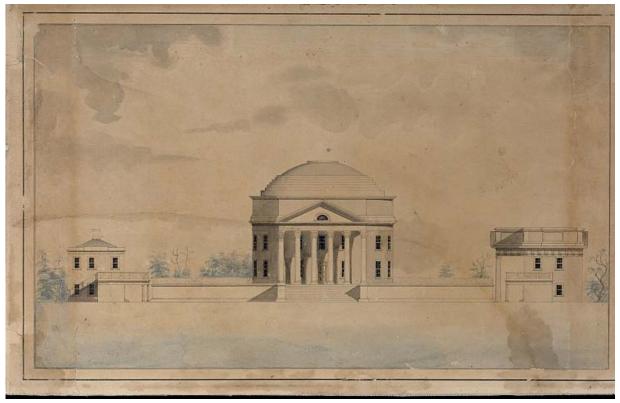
John Nielson's drawing of the south elevation of the Academical Village. Pavilion X on right. Albert and Shirley Small Special Collections Library, University of Virginia.
